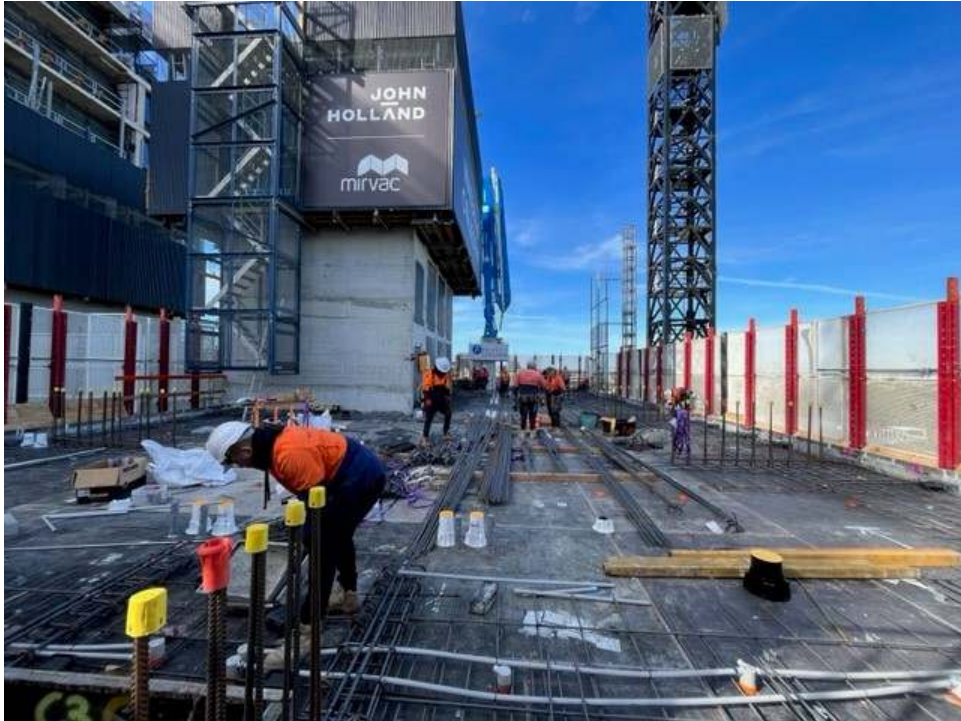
& 6: Rooftop Building 4 (Social Housing) – one diesel and one electric crane in use; Finishing works for the outdoor roof area were underway.
